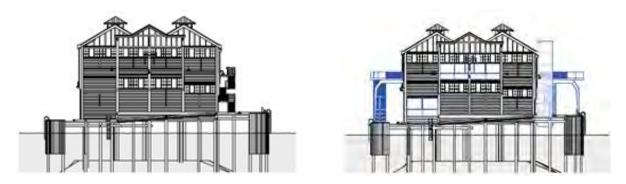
Existing and proposed north elevation to Pier 2/3 (proposed alterations shown in blue)
